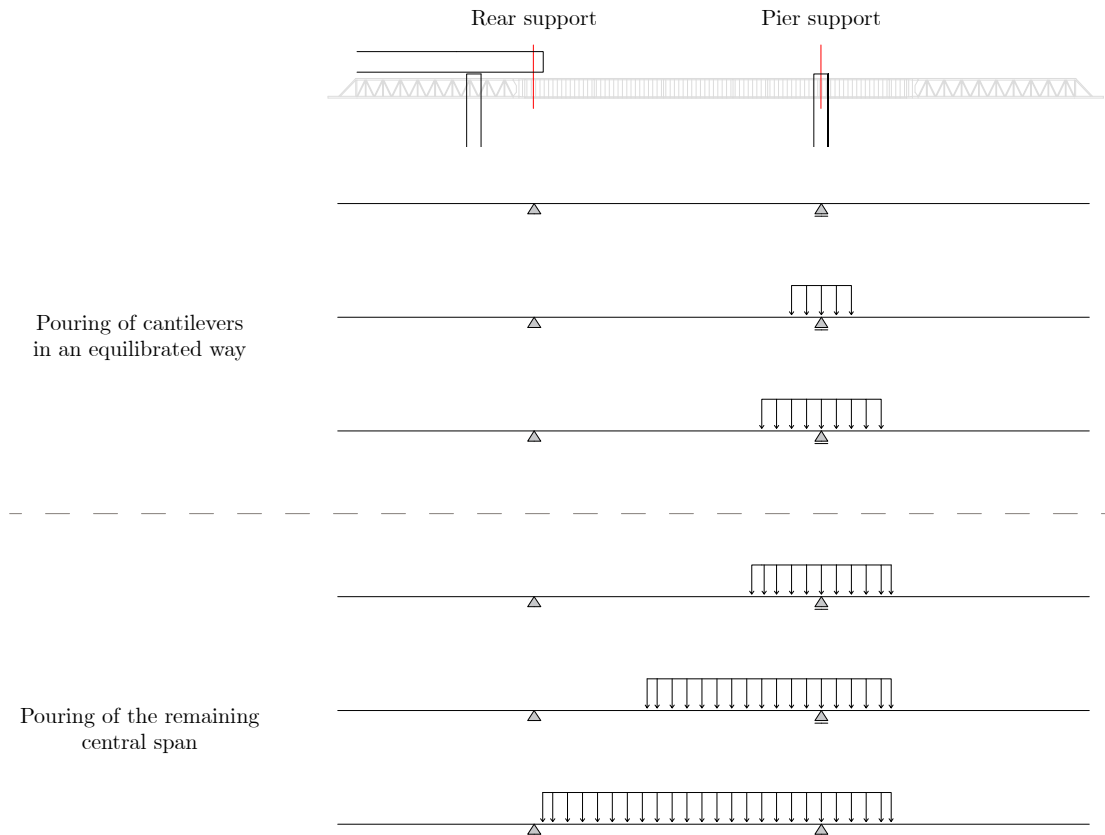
Typical pouring sequence in bridge deck construction with MSSs.
